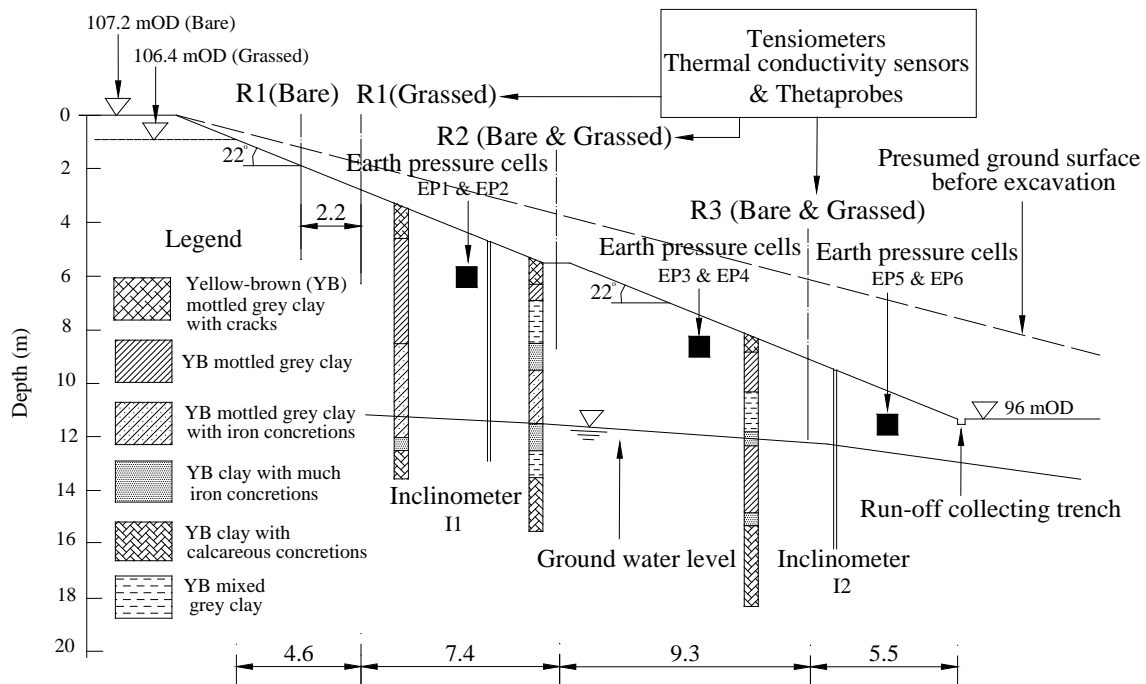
Cross-section of the instrumented slope (Ng et al., 2003 and 2009)
